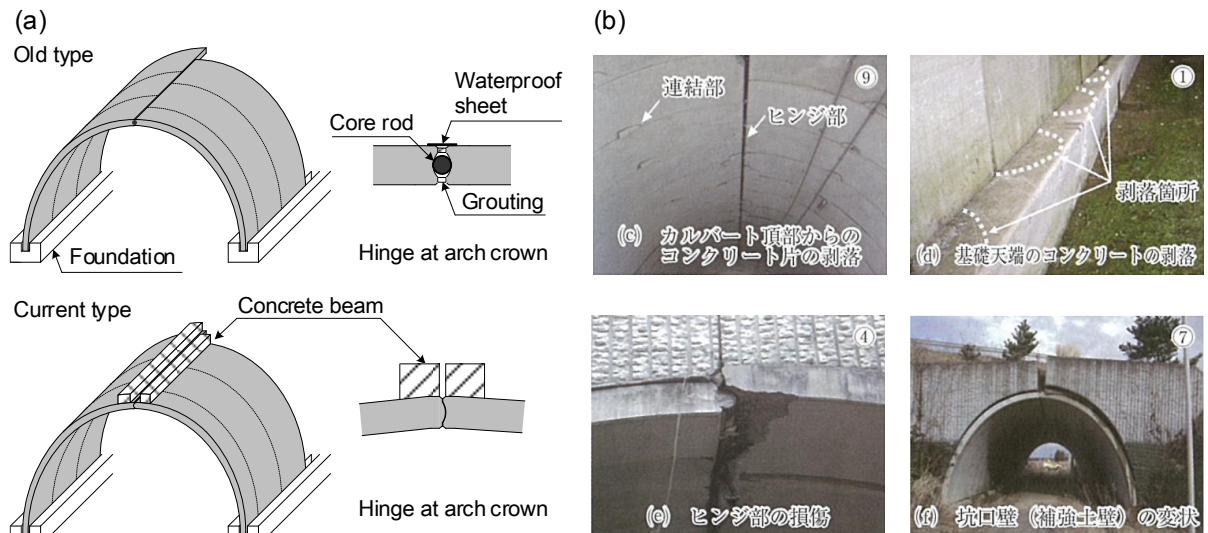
(a) Schematic drawings of old and current types of three-hinged arch culverts and (b) damage to old type of three-hinged arch culvert due to Great East Japan Earthquake (cited from report by Abe and Nakamura, 2014).
